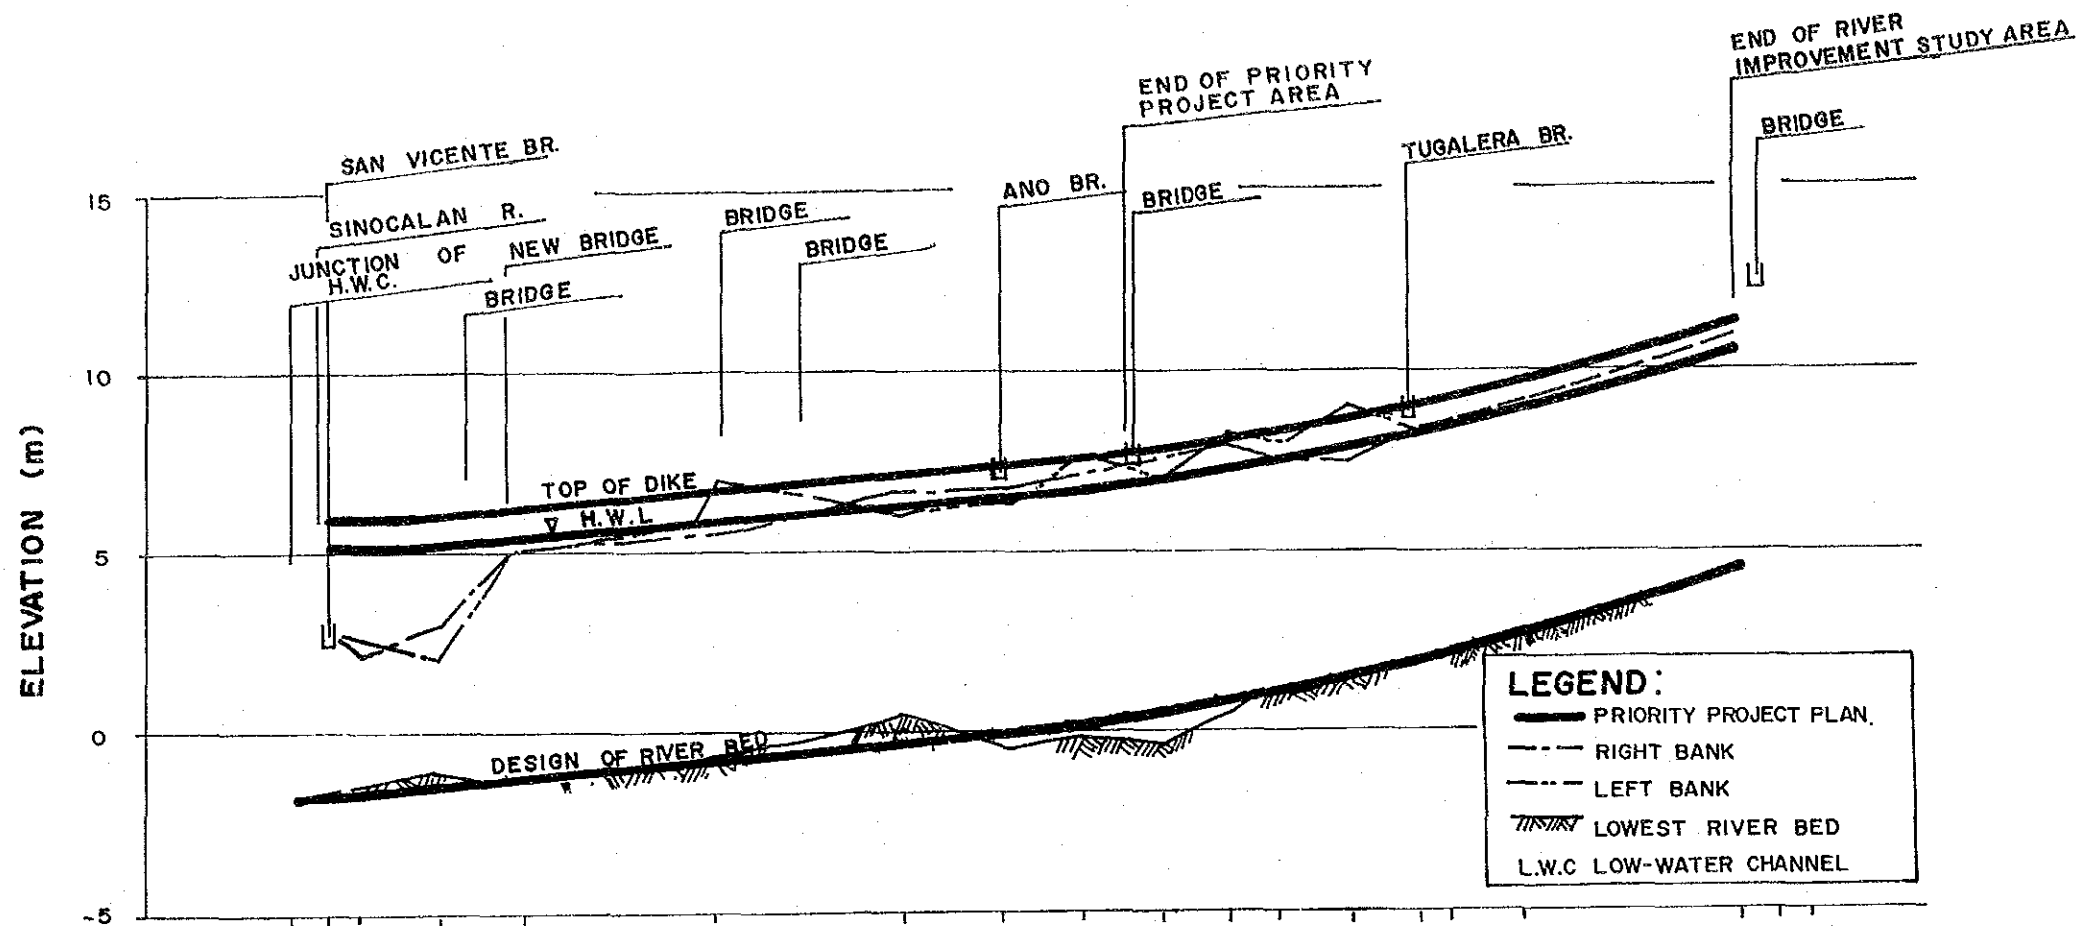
DESIGN PLAN OF INGALERA RIVER (2/2)
